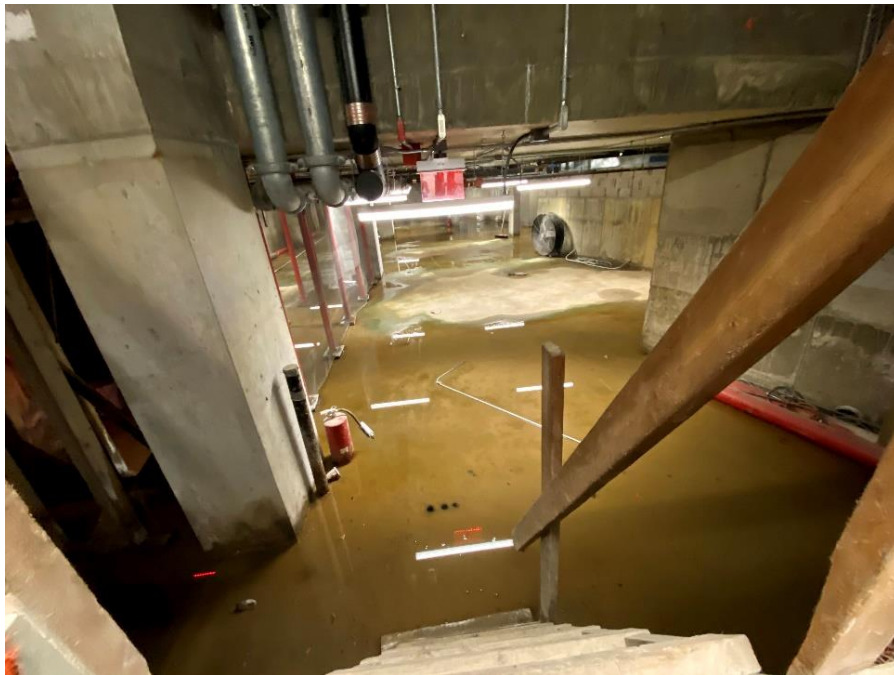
Southwestern part of the future enclosed ventilated garage and composite cover system (facing southwest).
